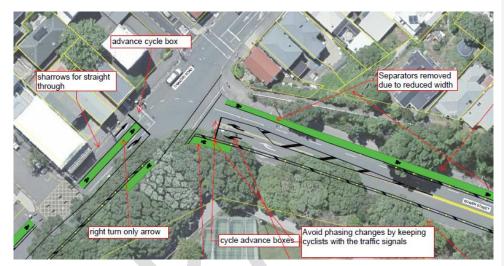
Excerpt from plan - Tinakori Rd / Bowen St intersection (C13)
